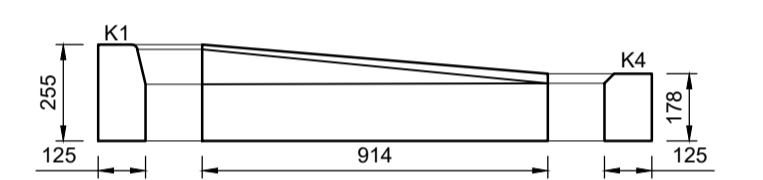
(EF1) - TYPICAL EDGING KERB DETAIL
